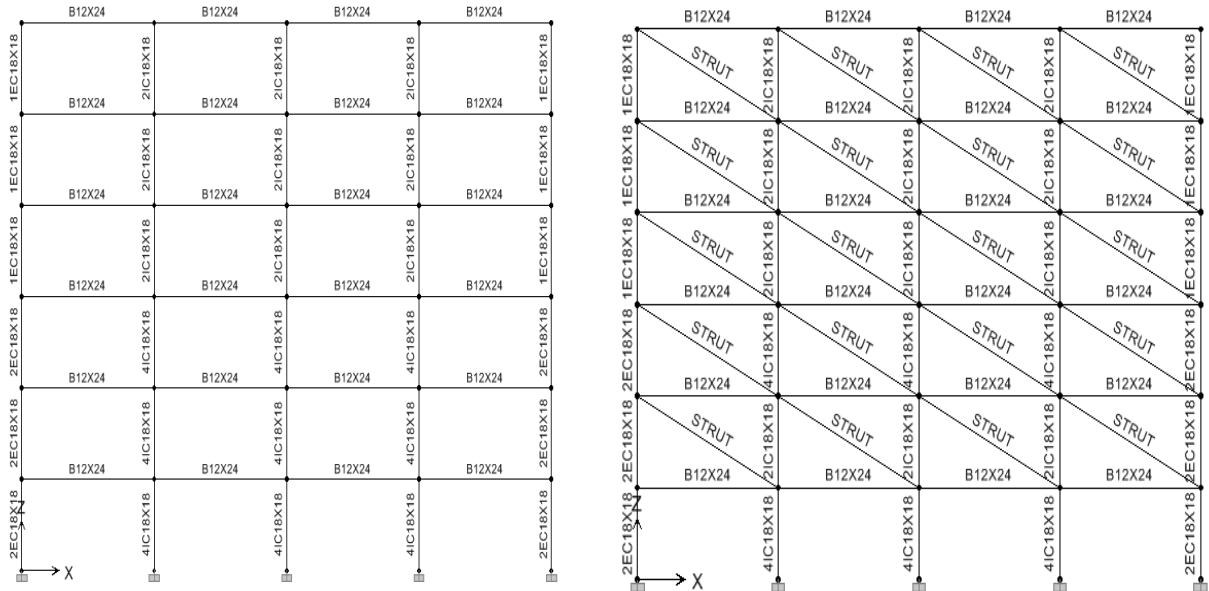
Idealized 2-D model in ETABS – Without infill walls (left) with infill walls (right)
